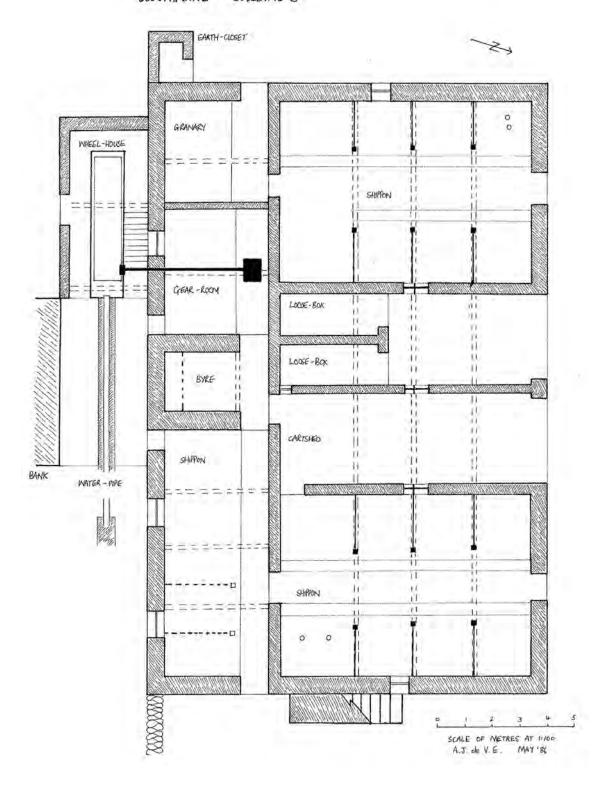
1986 survey, Building 3 ground floor plan (Higgins 1986).
